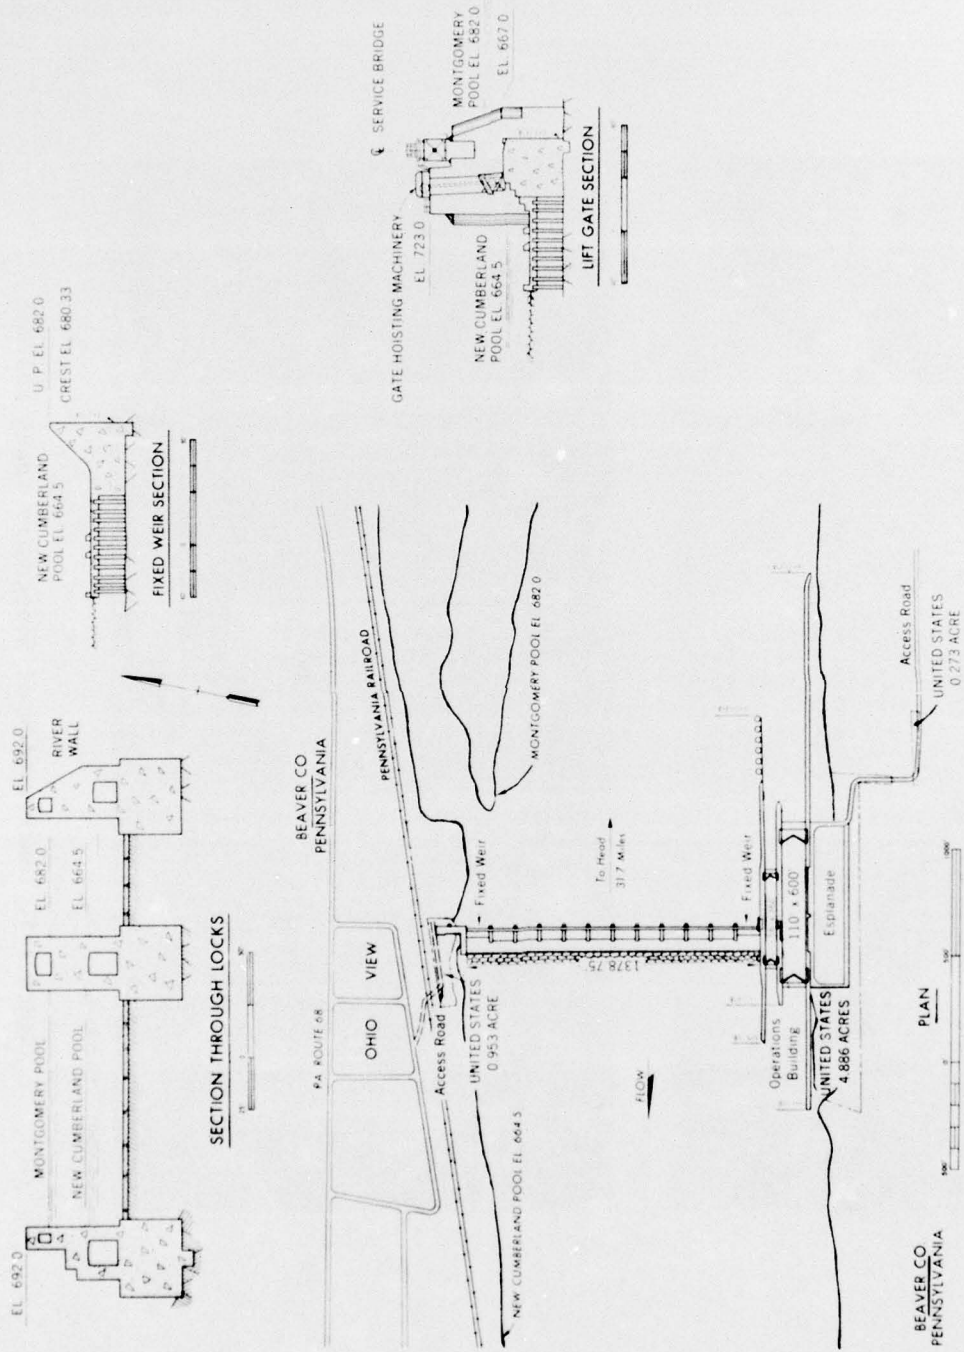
Plan and sections of Montgomery Locks and Dam.
